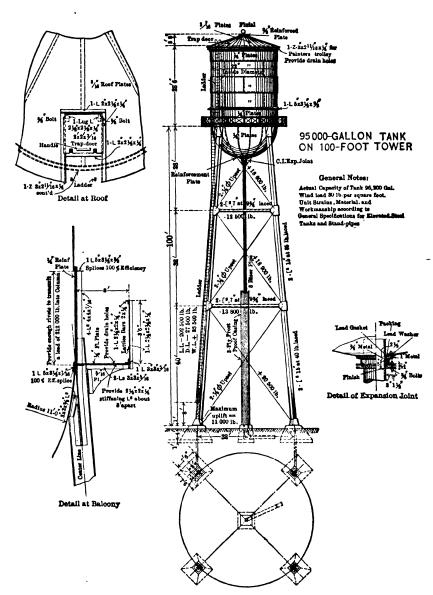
STANDARD PLAN OF ELEVATED TANK ON TOWER, BY C. W. BIRCH-NORD. (Trans. Am. Soc. C. E., Vol. 64, 1909.)
